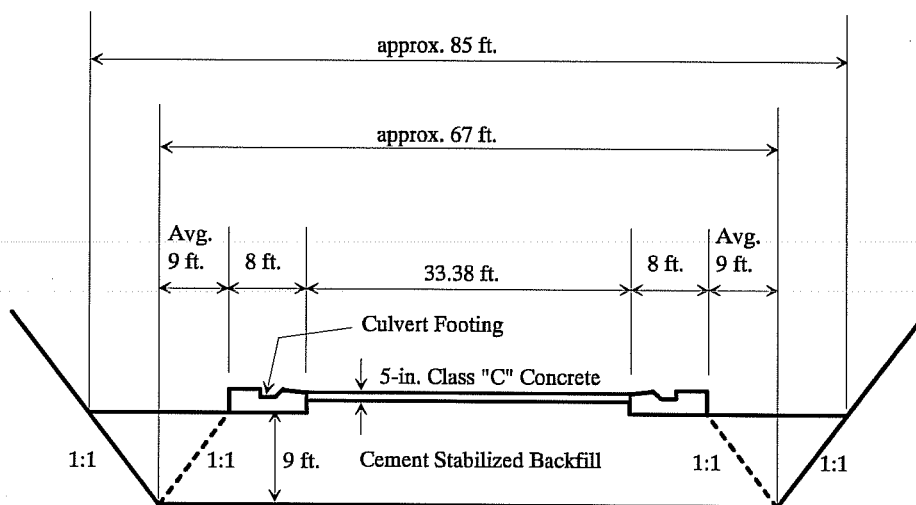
Typical section through high fill region showing cement stabilized backfill foundation
